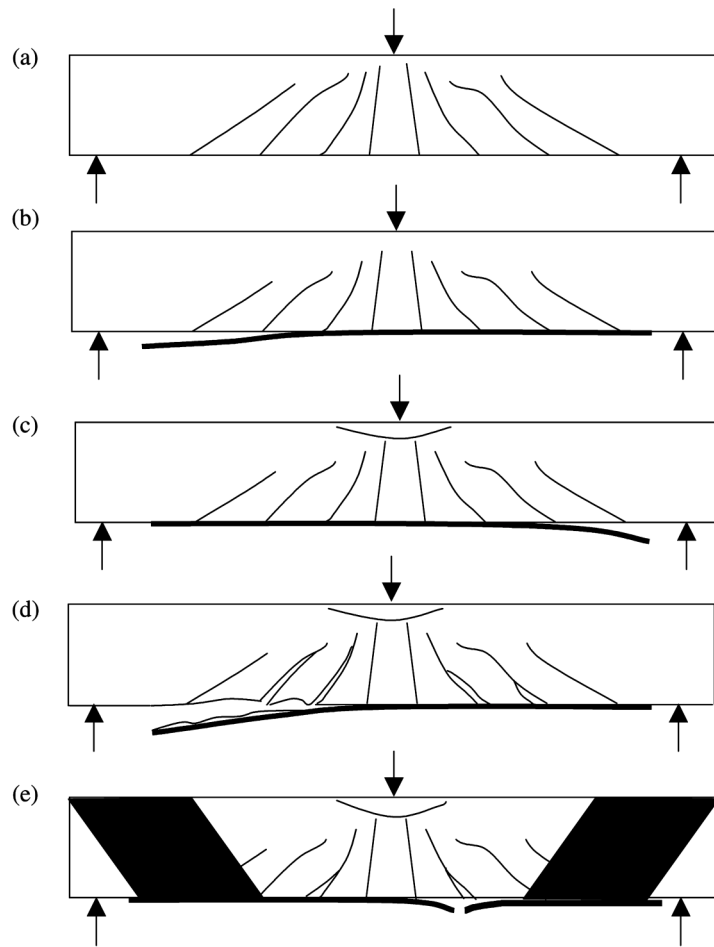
Failure modes of unstrengthened and strengthened RC beams for Group 1 and 2: (a) Flexural failure; (b) Tension-shear failure between concrete surface and the CFRP sheet; (c) Crushing of compressive zone in concrete and then tension-shear failure; (d) Concrete cover separation; (e) CFRP rupture
